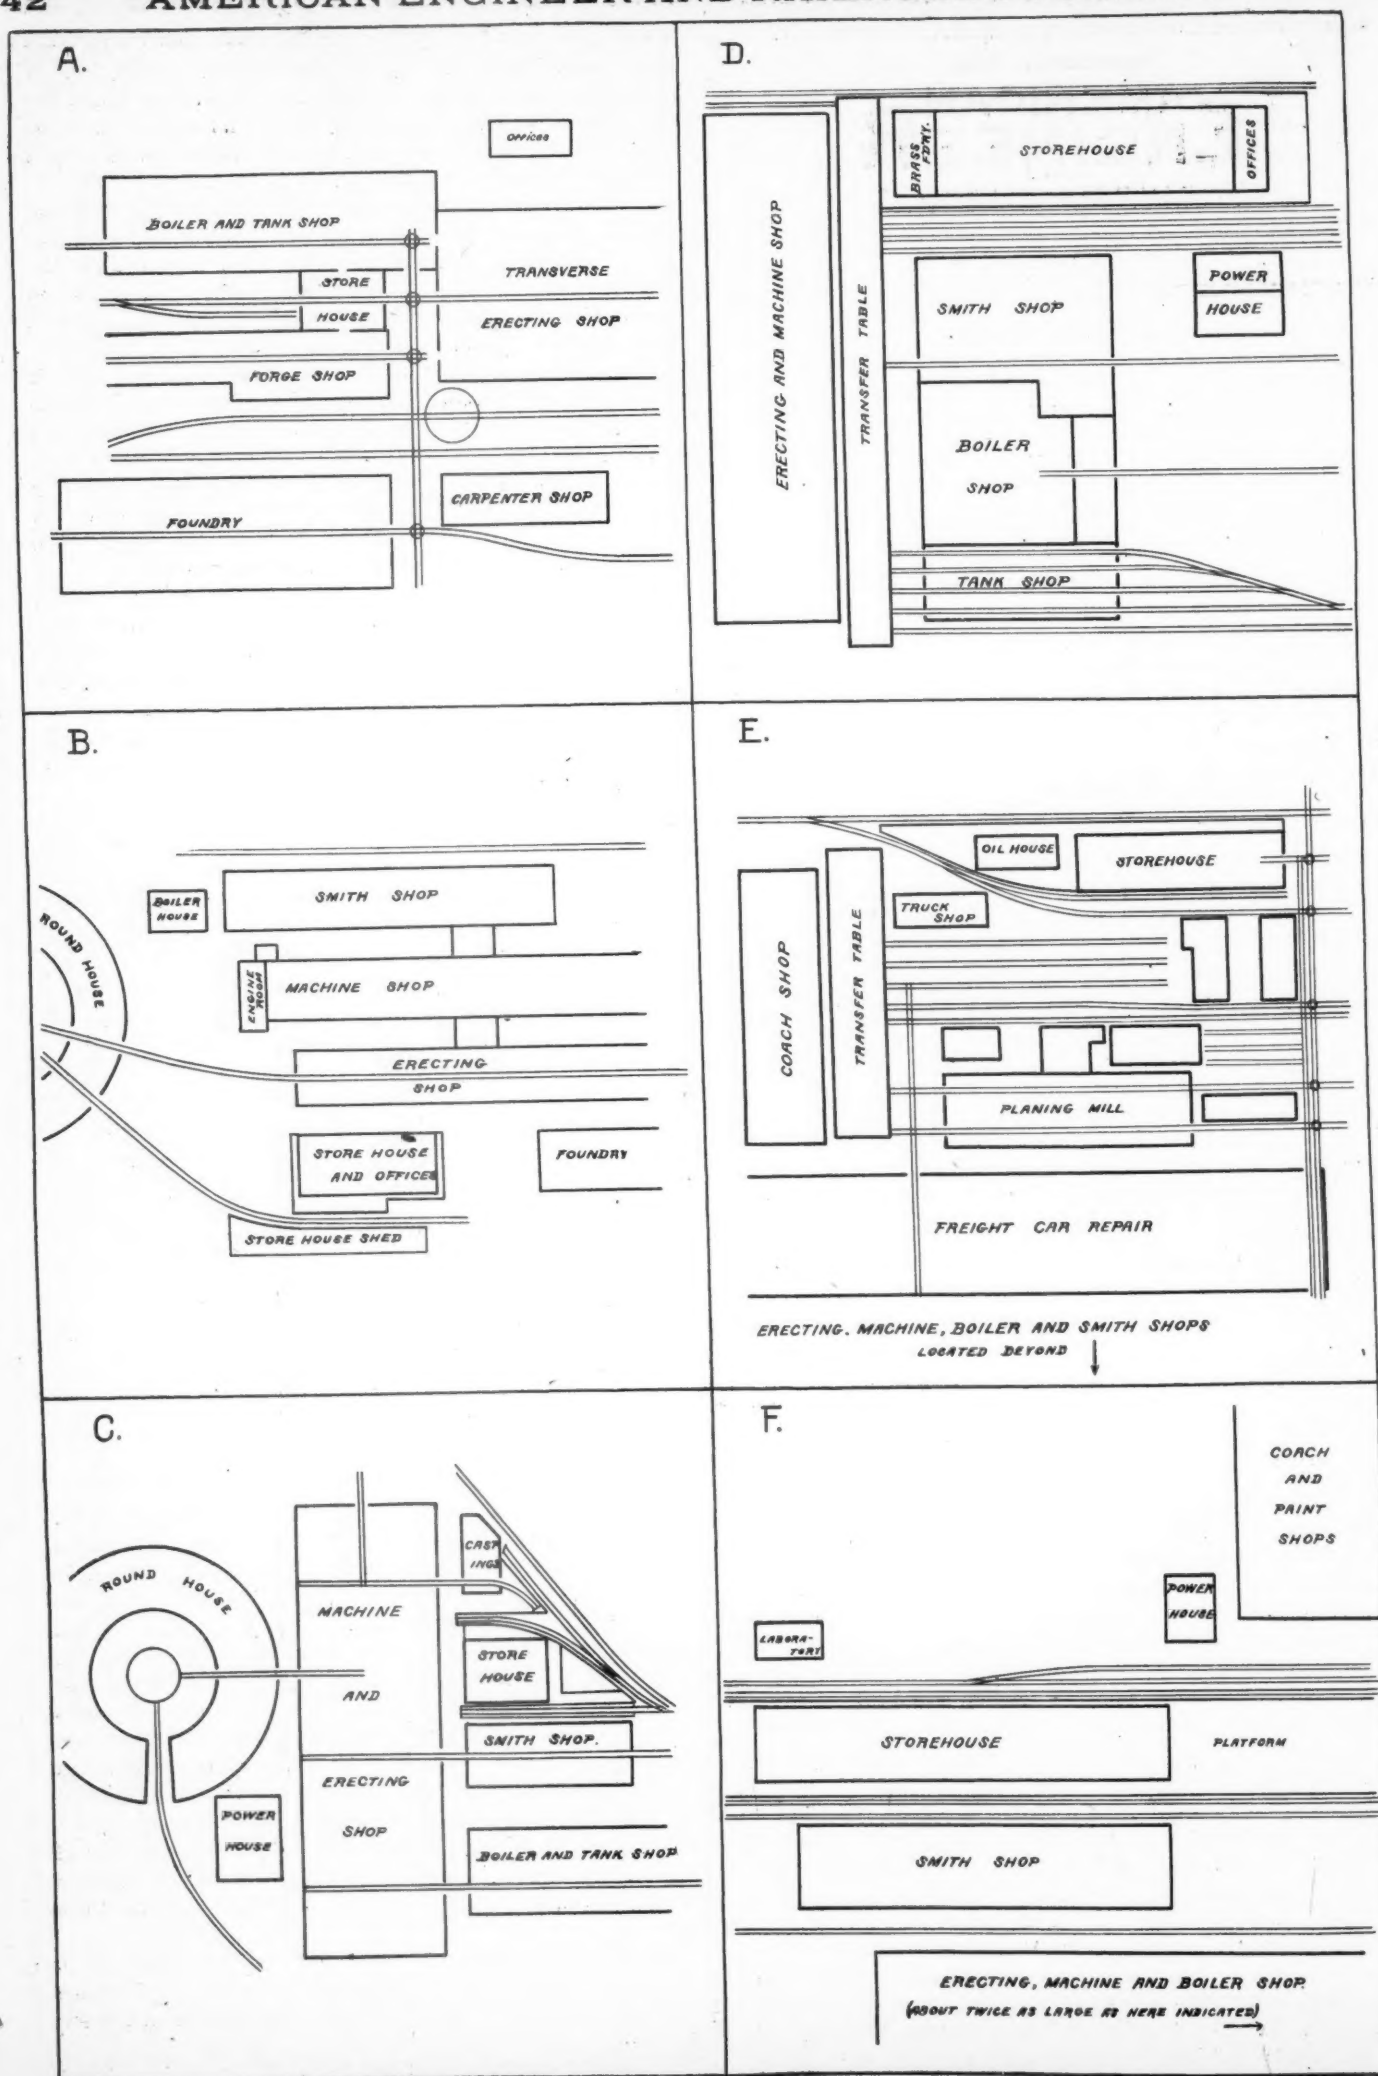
TYPICAL STOREHOUSE TRACK ARRANGEMENTS.
